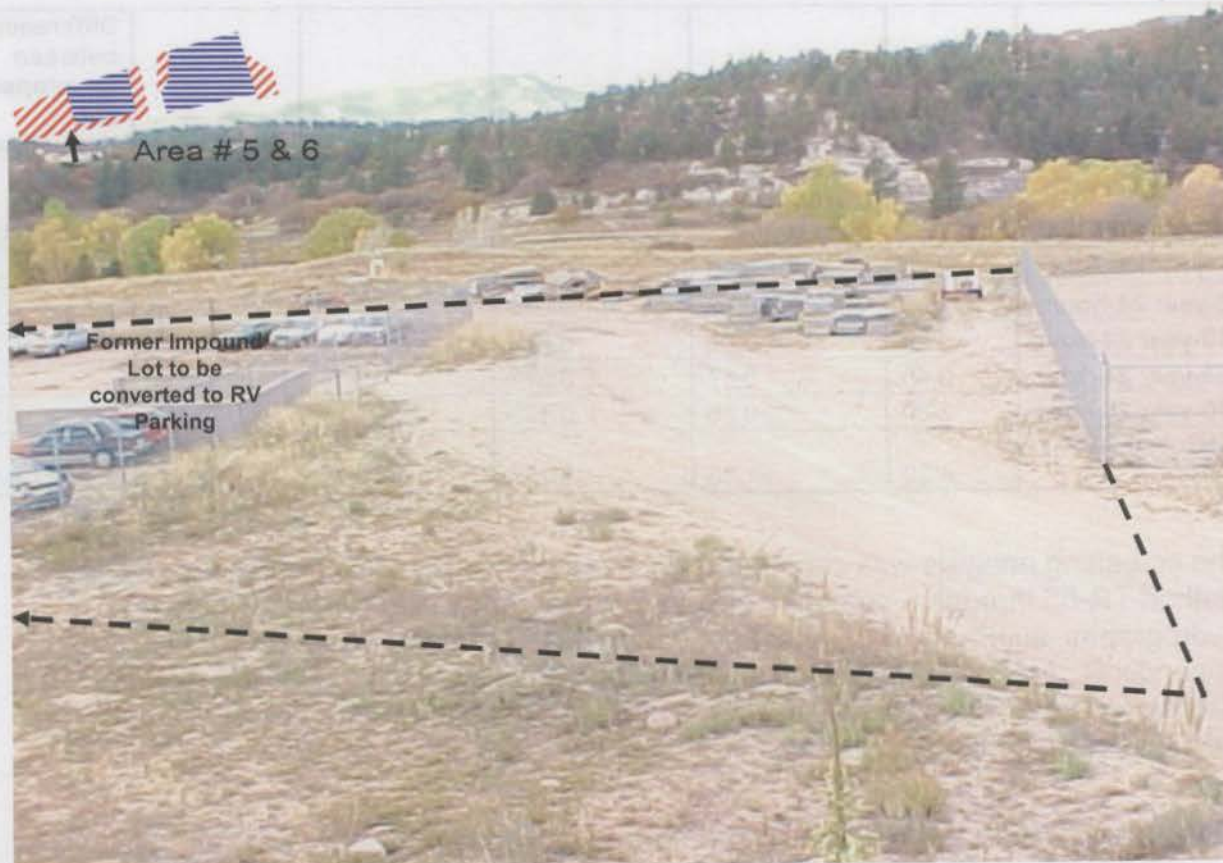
Proposed Expansion Areas Nos. 5 and 6 Looking West
